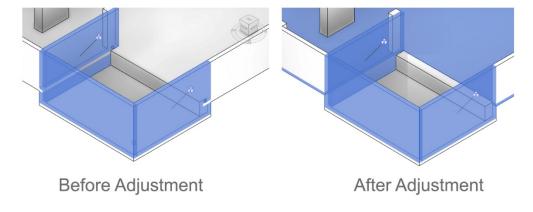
Adjusting the Floor Slab to Avoid cutting walls
